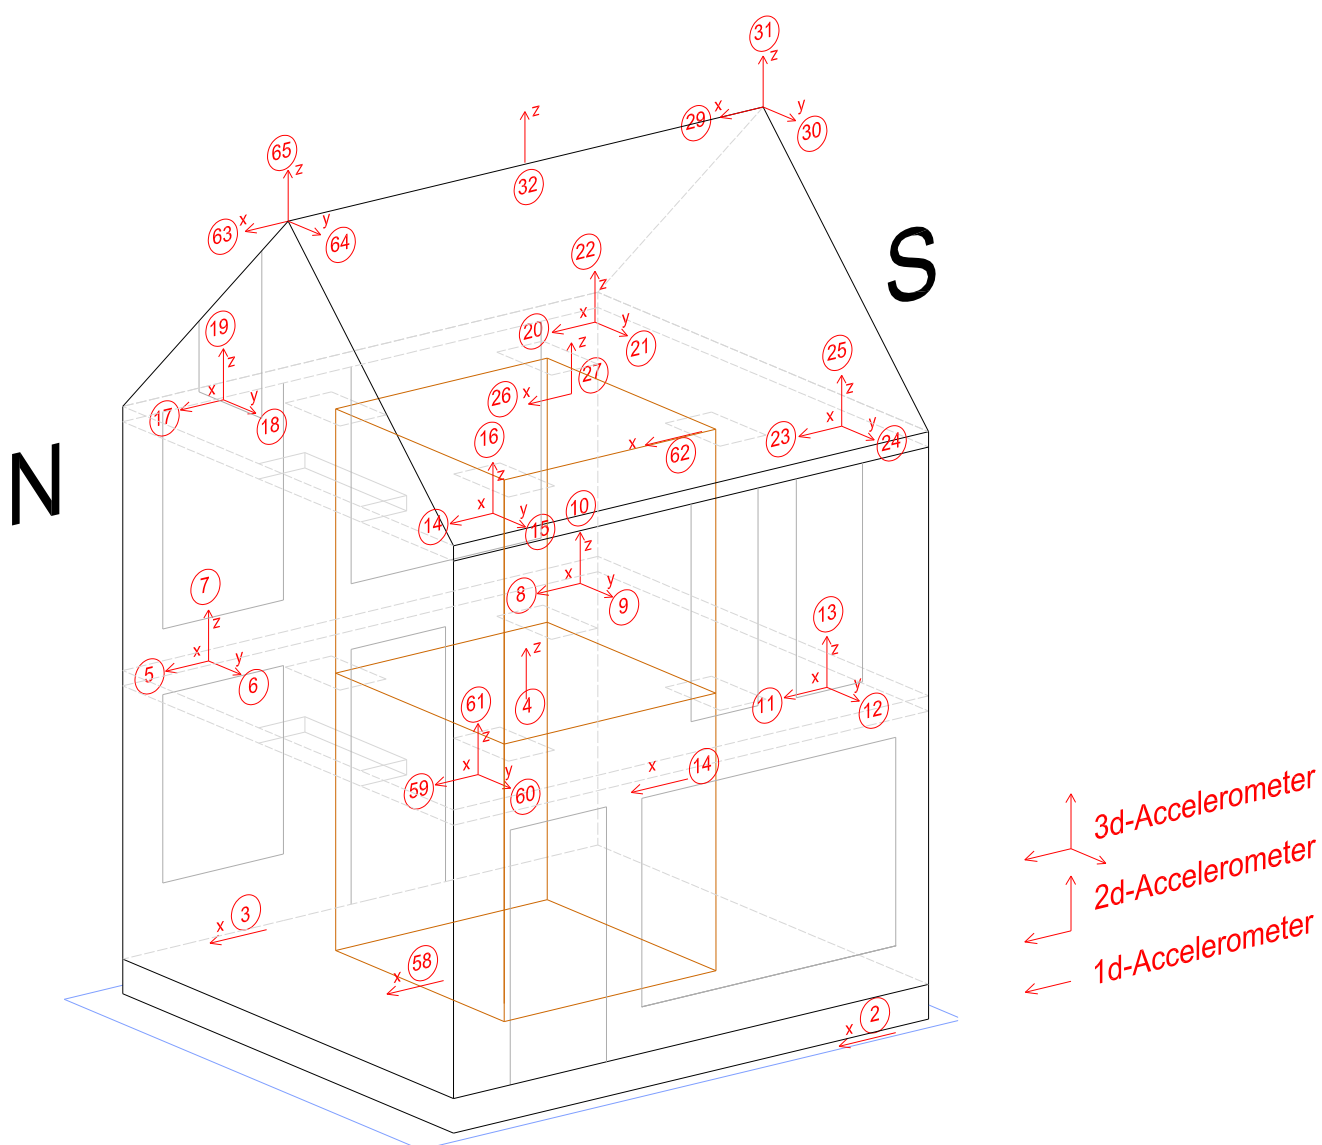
Accelerometer 3D view: foundation, first floor, second floor and roof diaphragms.
